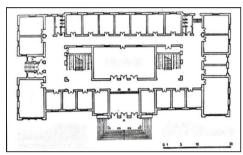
Ankara Old Ministry of Foreign Affairs Building, Ground Floor Plan, (Aslanoğlu, 2010, 125)
